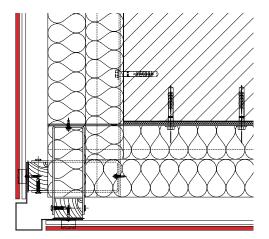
DETAILS OF CLAPBOARD FIXING WITH BRACKETS
